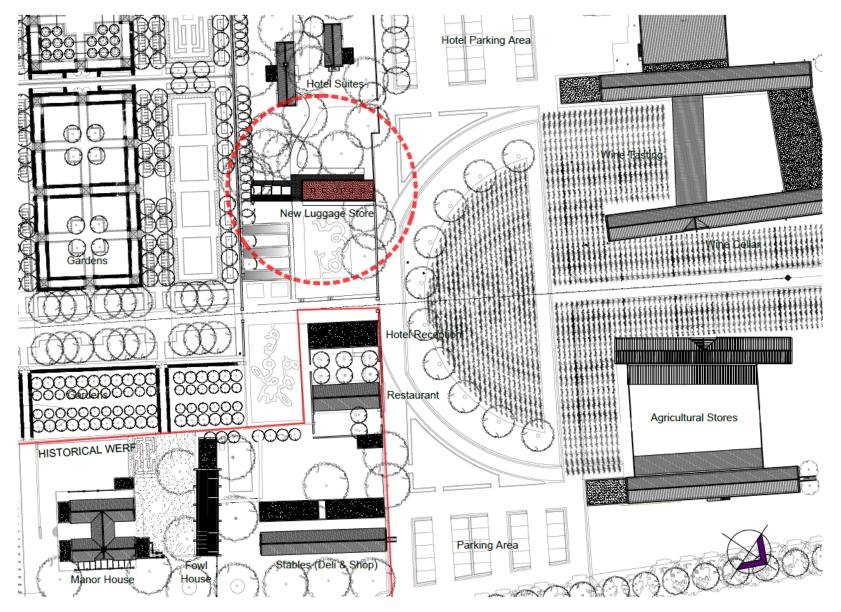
Site plan showing the proposed development in relation to the historic werf and surrounding buildings.
